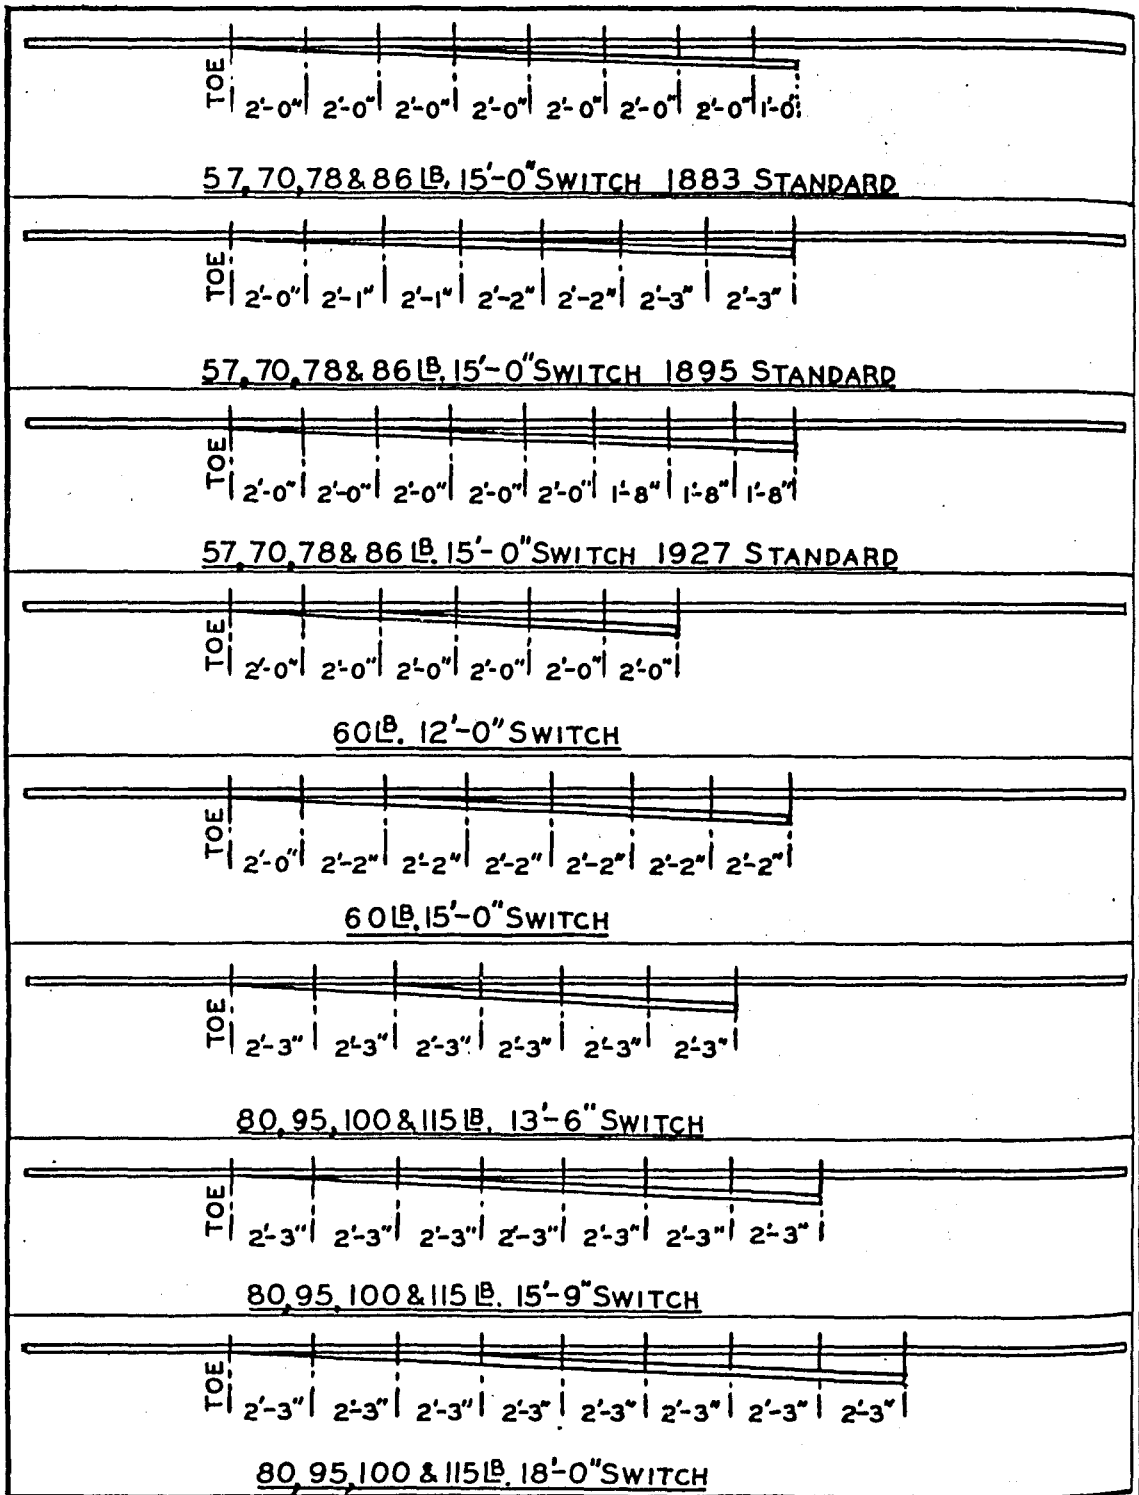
SPACING OF CHAIR PINS & BOLTS, X LAYOUT, STOCK RAILS.
